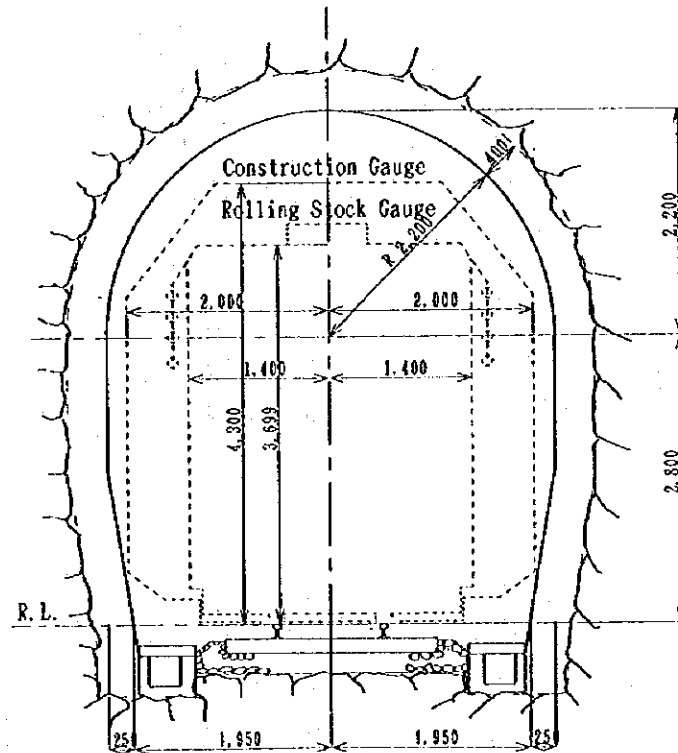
Typical Tunnel Cross-Section
